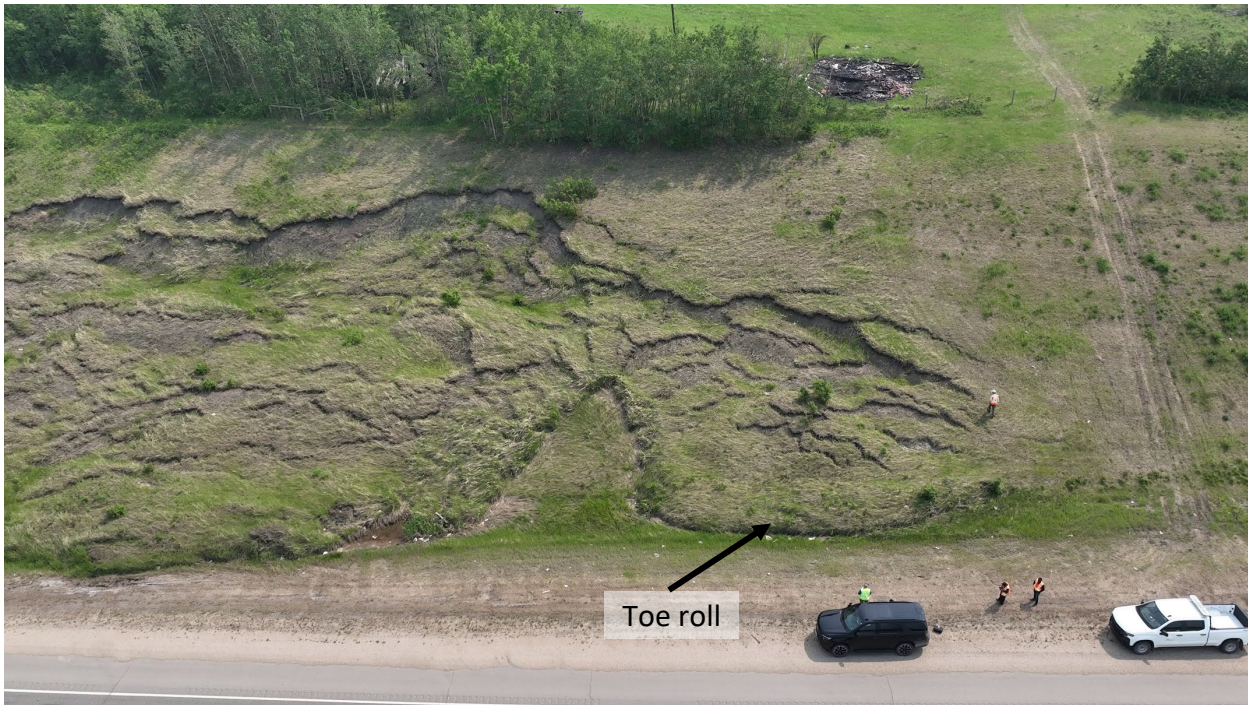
Overview of GP046 site on Hwy 43:04. UAV photo taken June 3, 2025, facing west.
